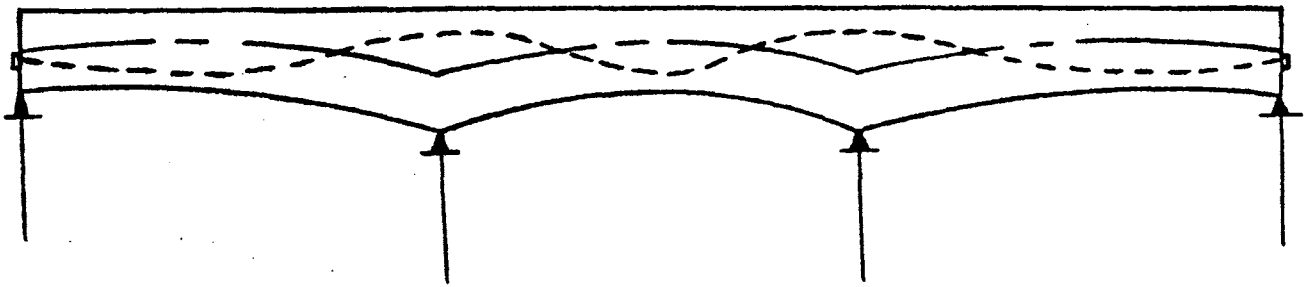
Continuous Prestressed Concrete Beam with Variable Depth and Reduced Curvature of Prestressing Tendon.
